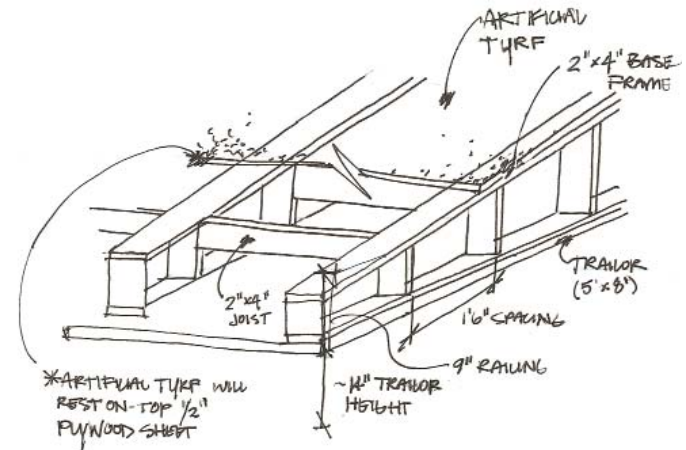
Conceptual Construction Sketch (Sickmann 2016)
